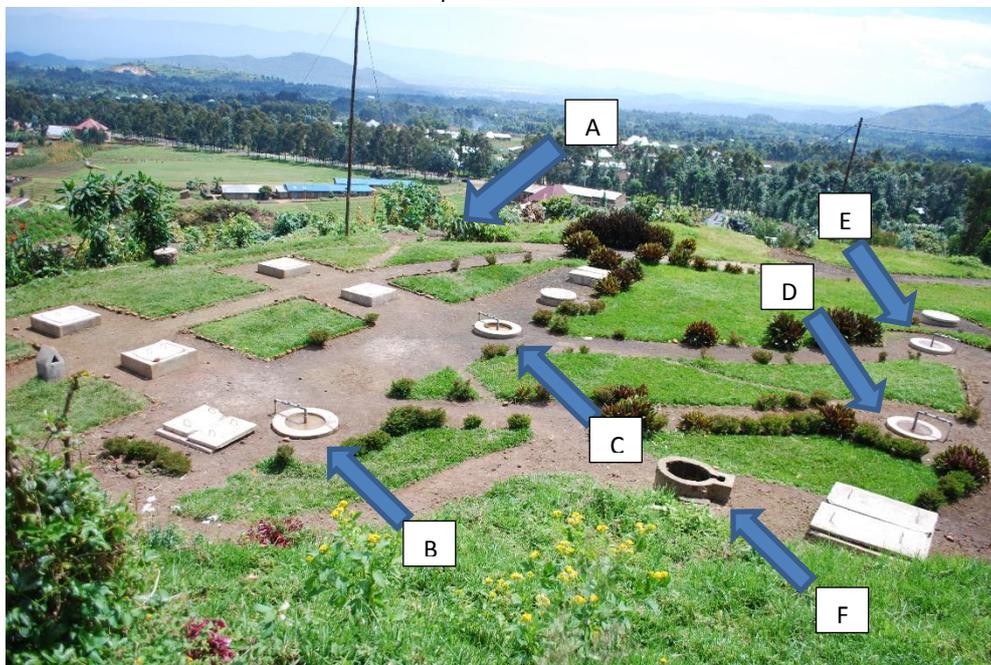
4x100m³ digesters installation in RUBAVU prison.
